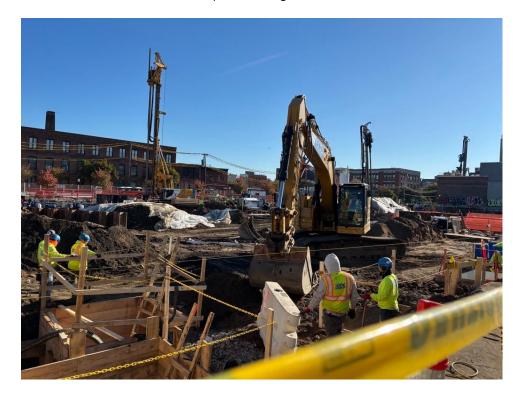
ECD grading in the northwestern part of the site (facing southeast)
